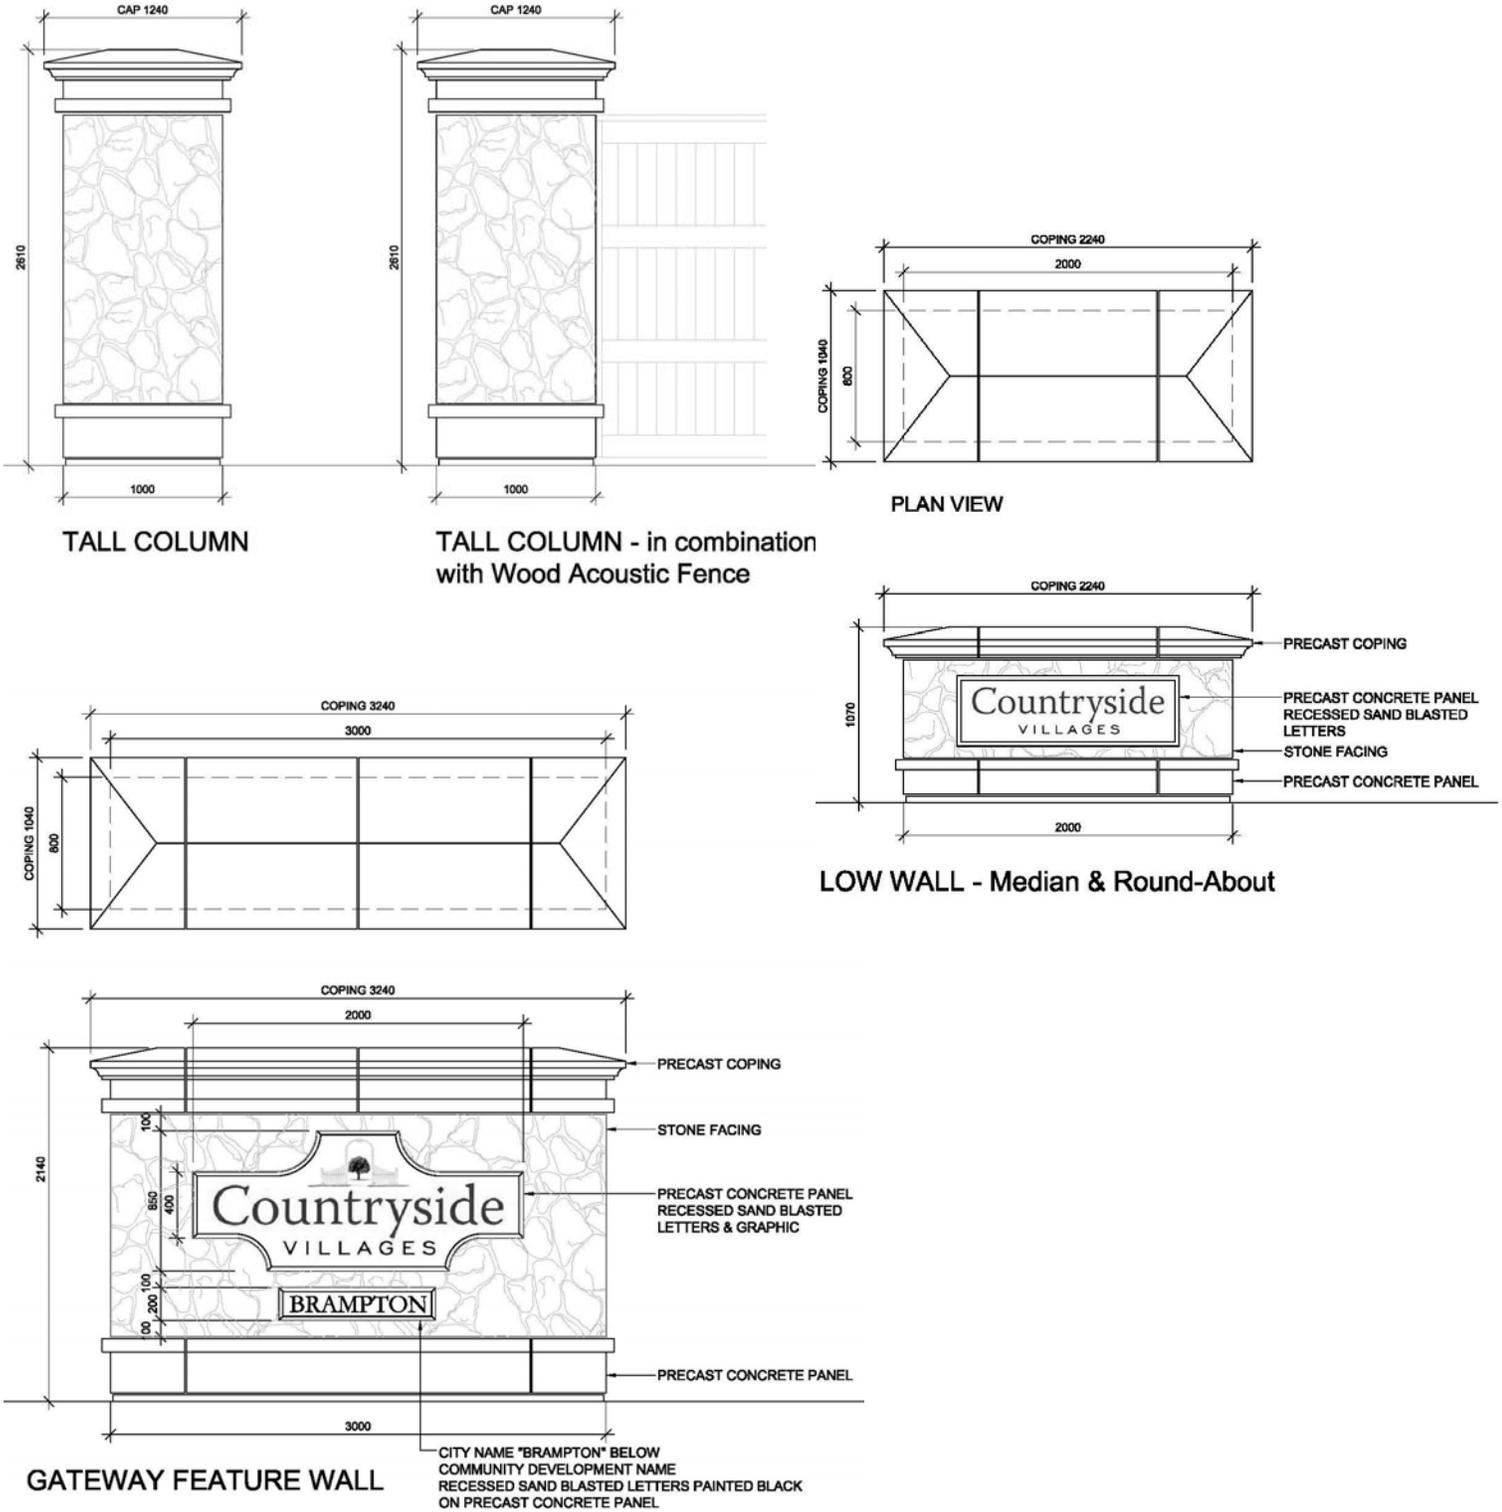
A Toolkit of Masonry Features for Area 48-1 – Tall Columns and Landscape Walls
